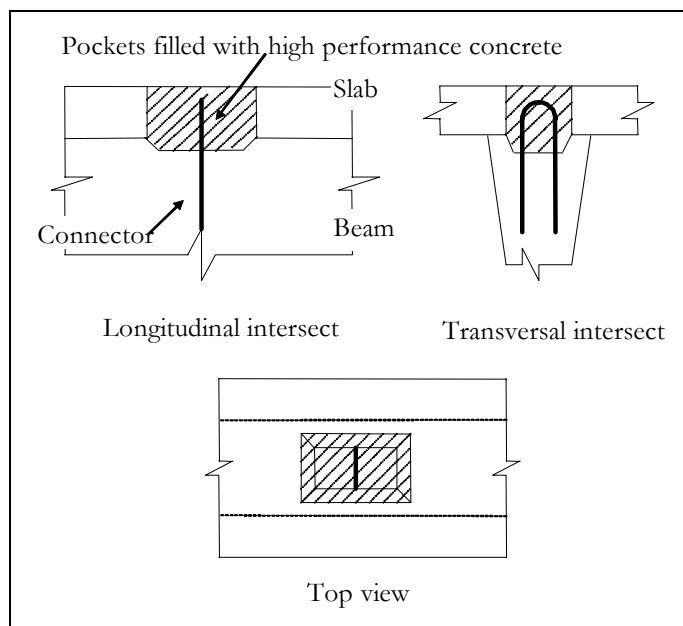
Beam-slab connection in precast concrete bridge decks.
